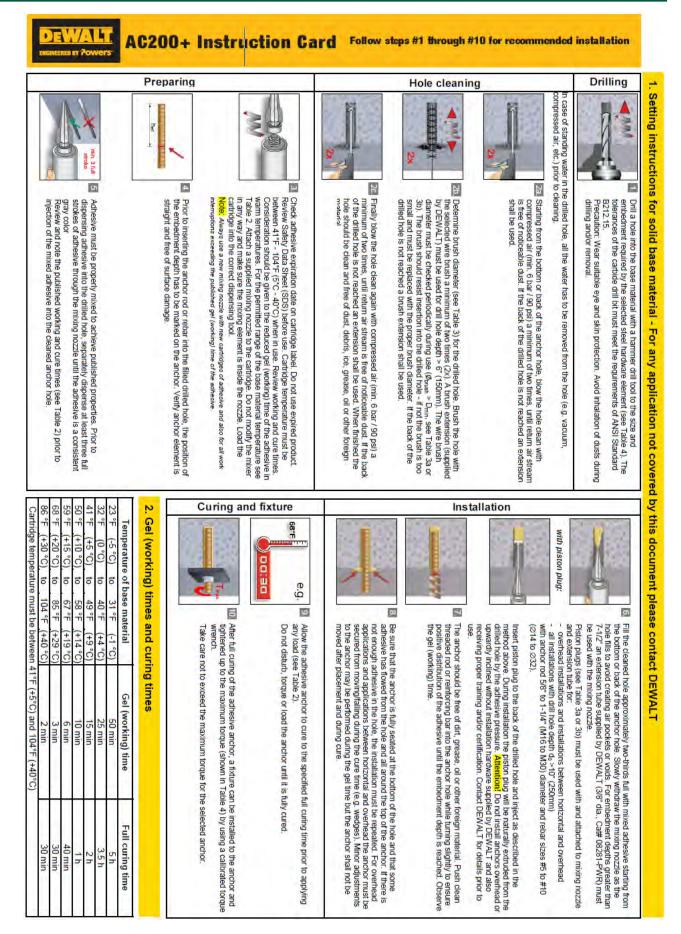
MANUFACTURER'S PUBLISHED INSTALLATION INSTRUCTIONS (MPII)
